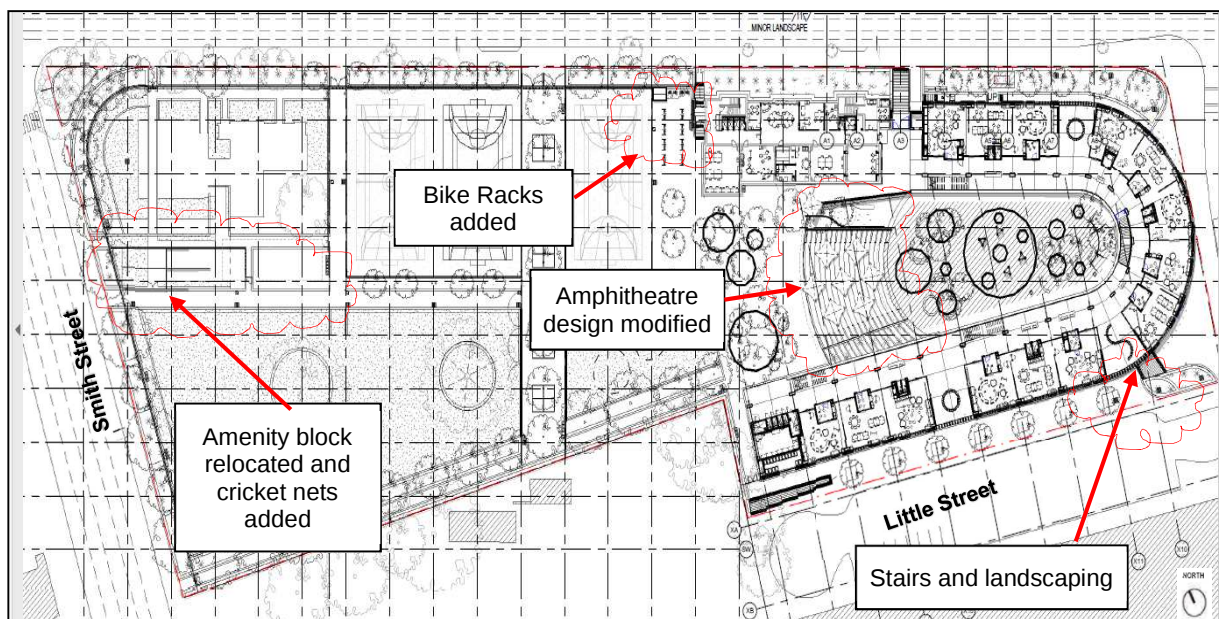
Proposed PPS Ground Floor Plan (Source: Applicant's Modification 3 EIS)
